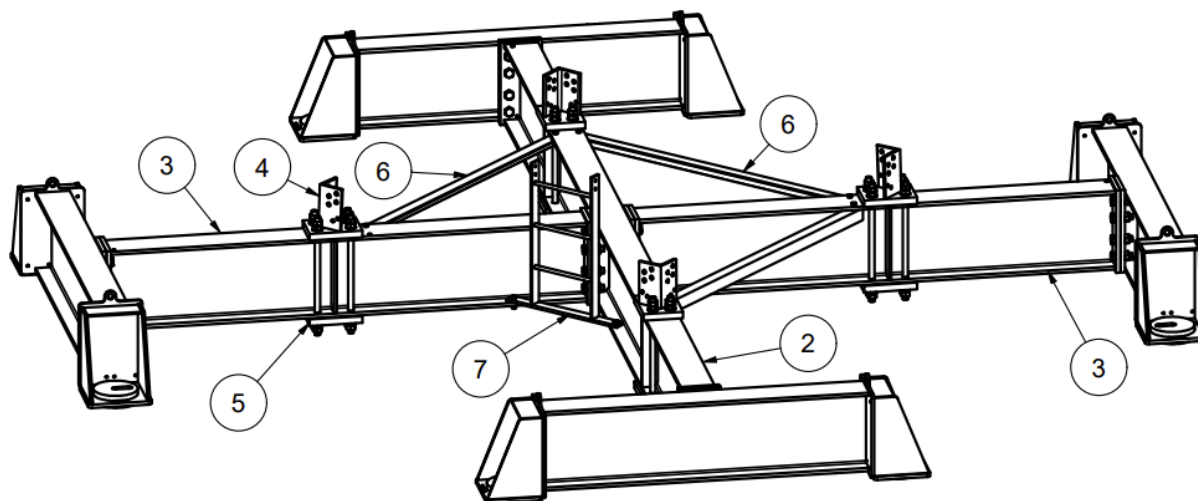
Typical 8-Pile Frame with ATS1301 Stubs
